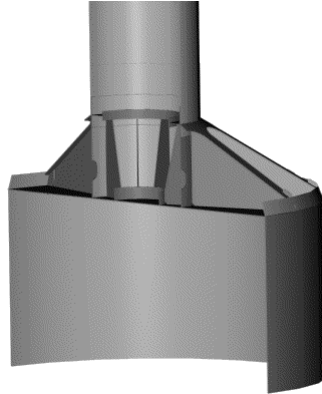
Sectional view of bucket foundation including reinforcement of top plate and superstructure for connection of wind turbine tower.
